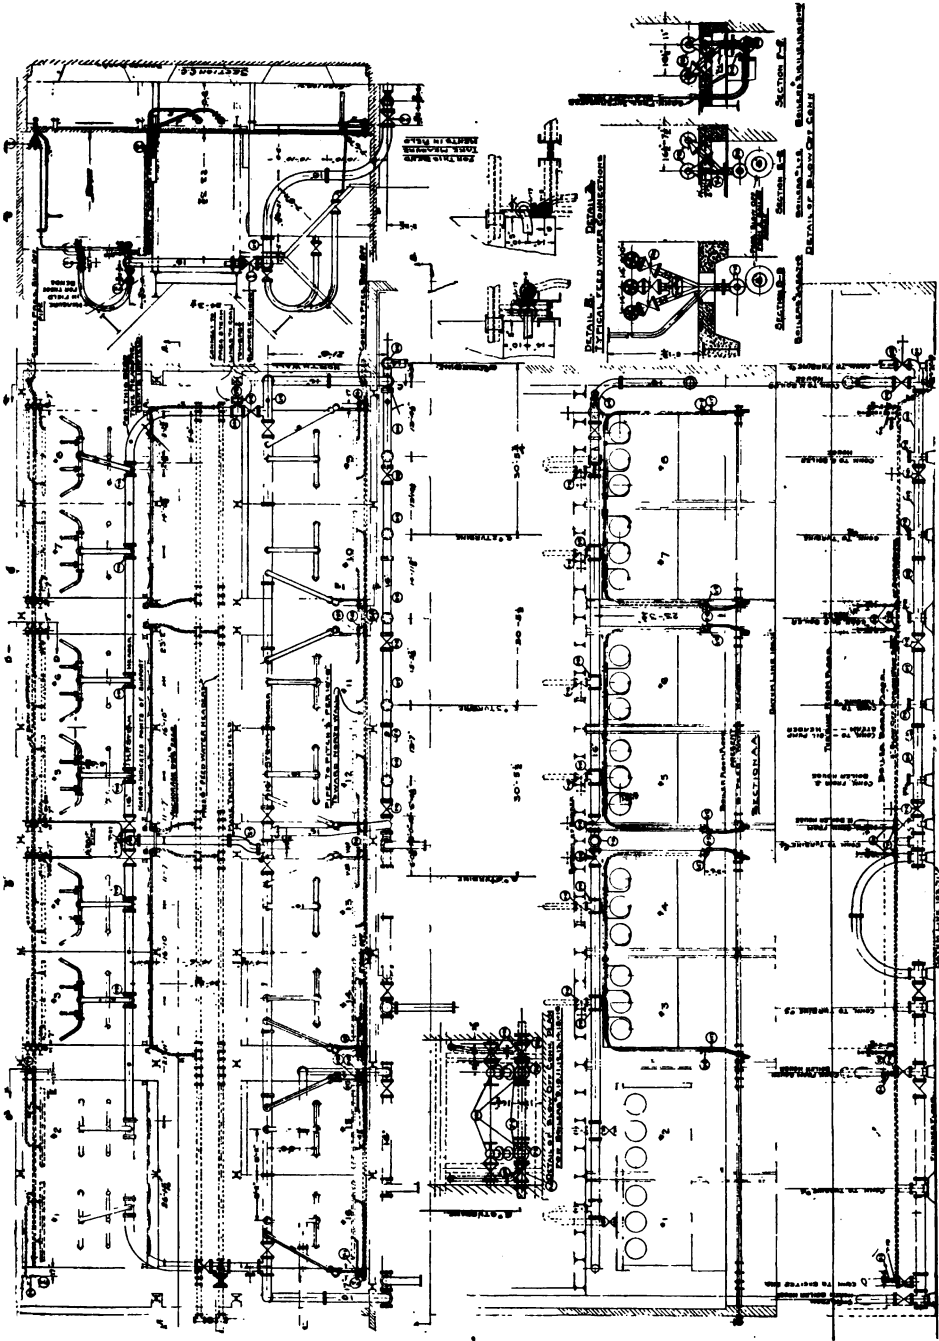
Plan and Elevation of High-Pressure Steam Feed and Blow-Off Piping, Gold Street Station.
